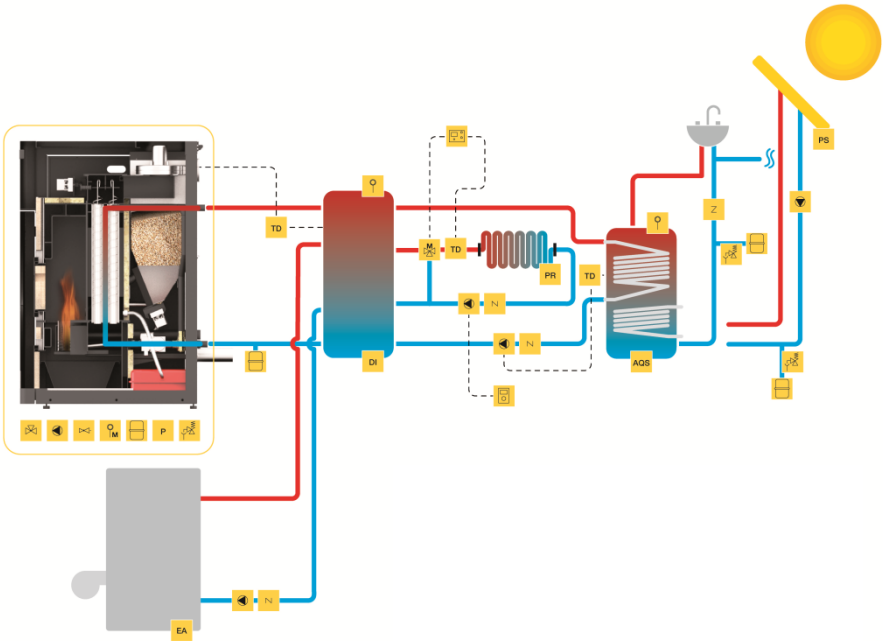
Connecting underfloor heating in conjunction with another boiler support and sanitary water combined with solar panel
